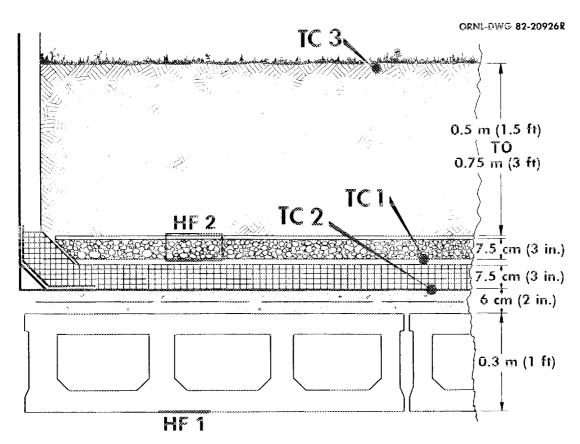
Cross section of the earth-covered roof section showing thermocouples TC1, TC2, and TC3 and heat flux transducers HF1 and HF2.
